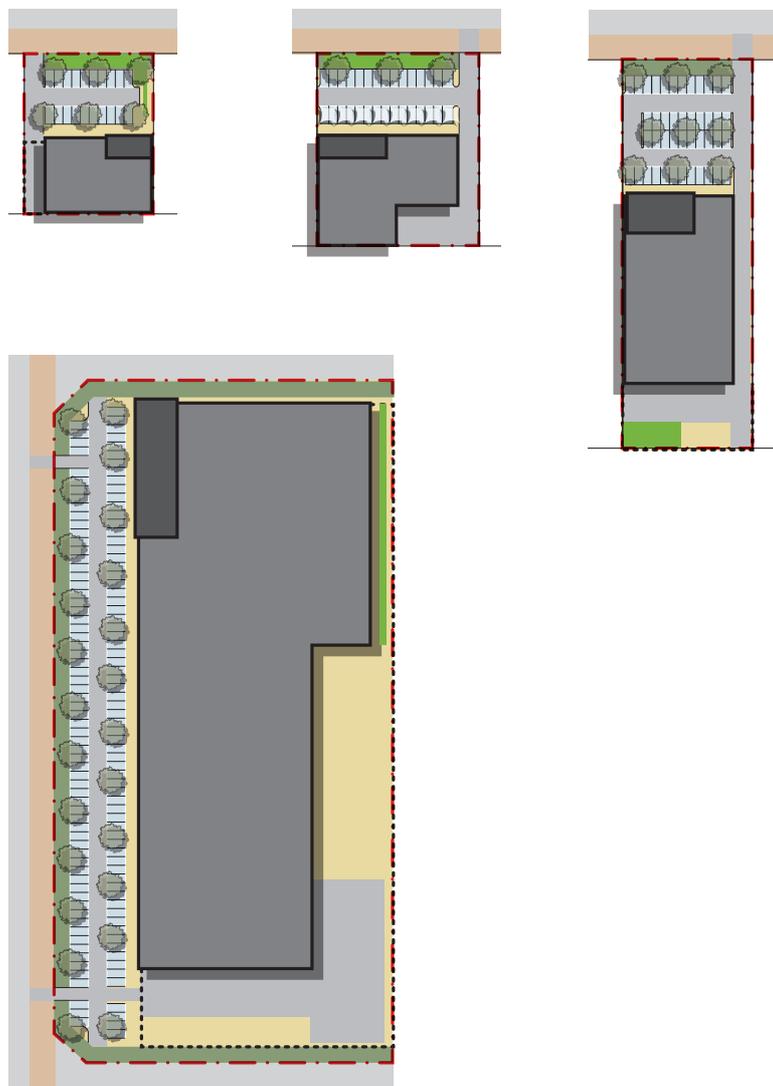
Examples of indicative parking layouts setbacks for different lot sizes.
